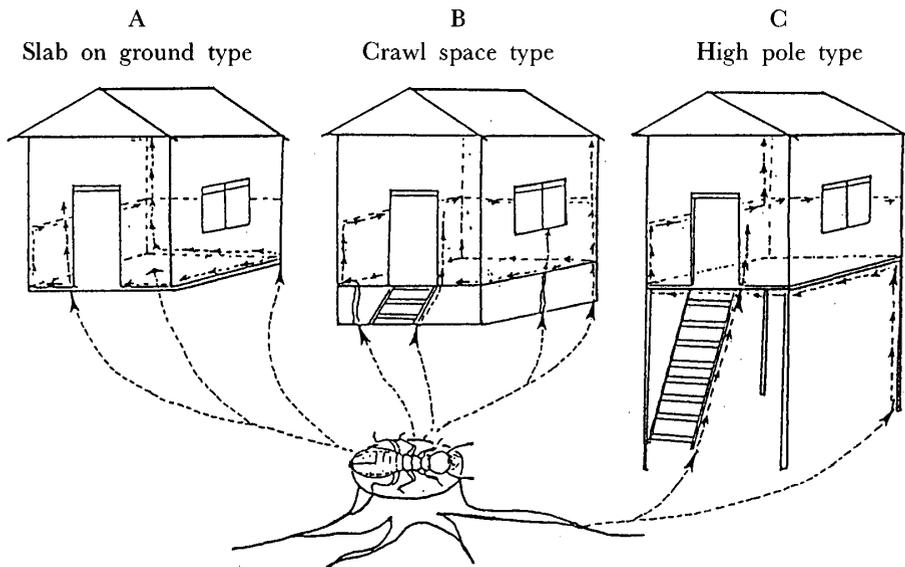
Illustrated diagram to show the point of entry of subterranean termite into three typical Thai building construction in model house test. A (SG) : Termites entered mainly at an improper basement construction or directly attacked wooden part is in contact with ground, B (CS) : Termites made hidden way through interior pole or improper concrete foundation under crawl space or some time built their way along the exposure barriers in contact with ground, C (HP) : Termite entered through the shelter tubes along poles or other structural parts in contact with ground.
